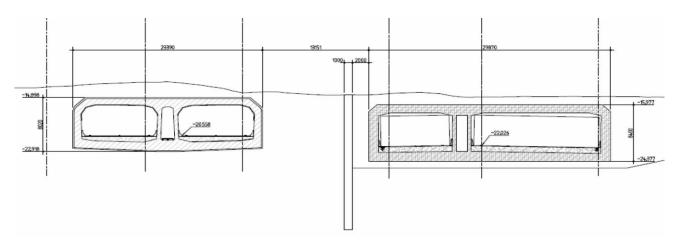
Typical cross section, showing the small distance between the new and the existing tunnel.
